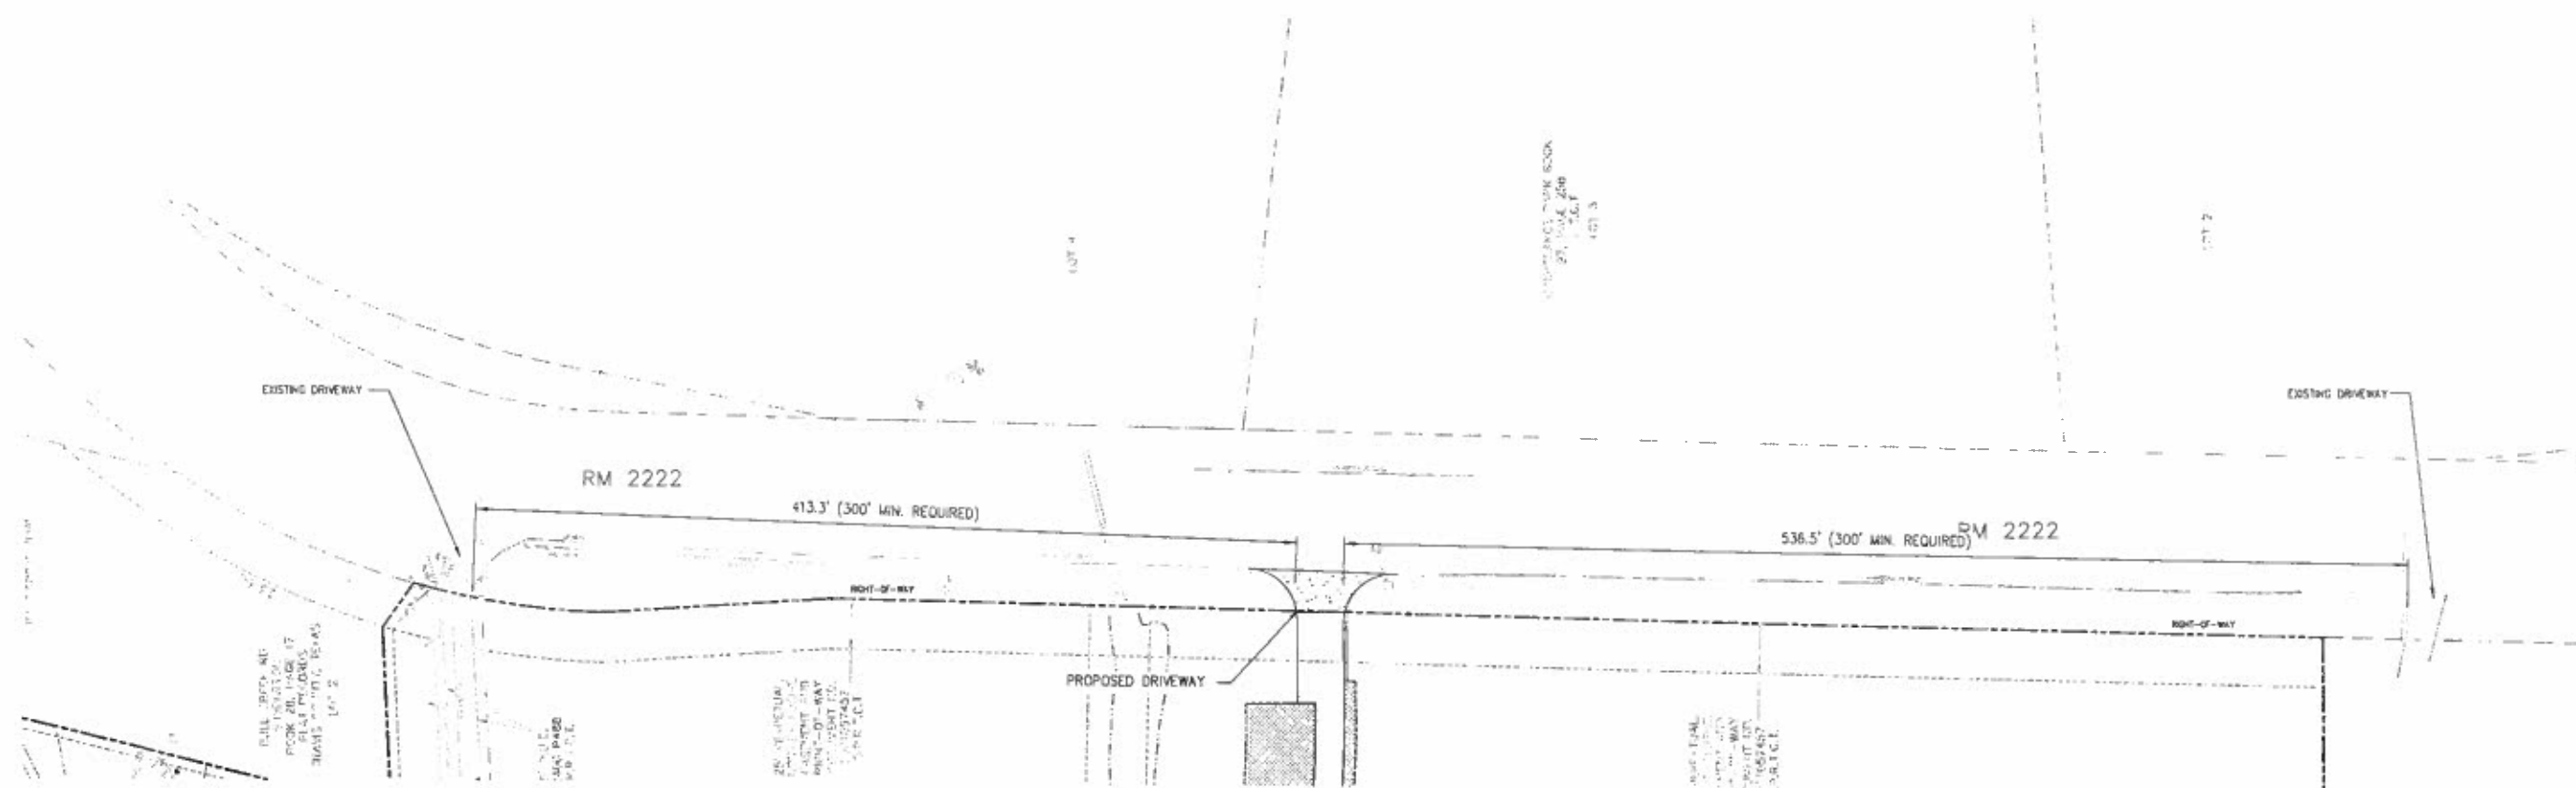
EXHIBIT M - DRIVEWAY DETAILS - (3 of 5)
